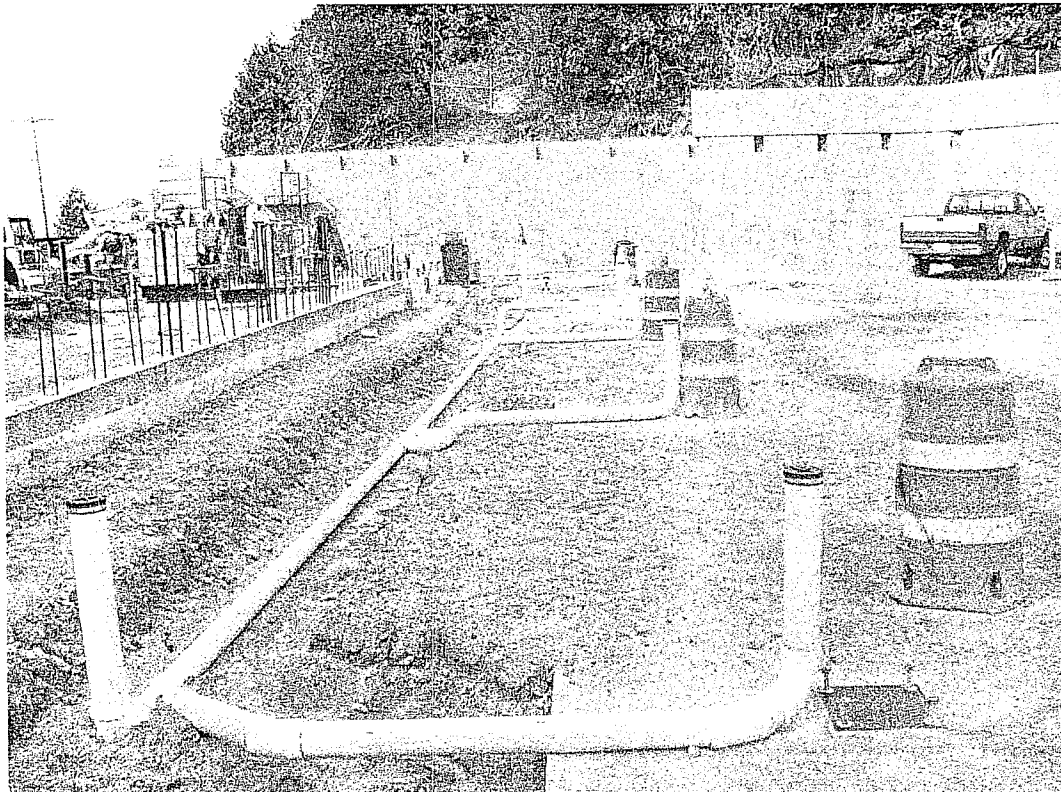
Sewer pipes that will be adjacent to interior garage columns at grid H
